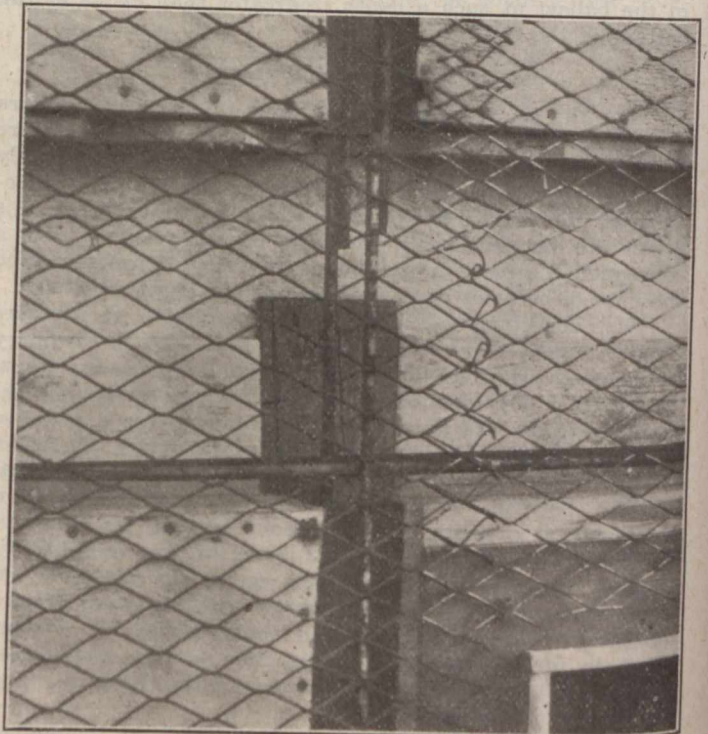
SHOWING DETAILS OF CONNECTION BETWEEN COLUMN AND GIRDER
